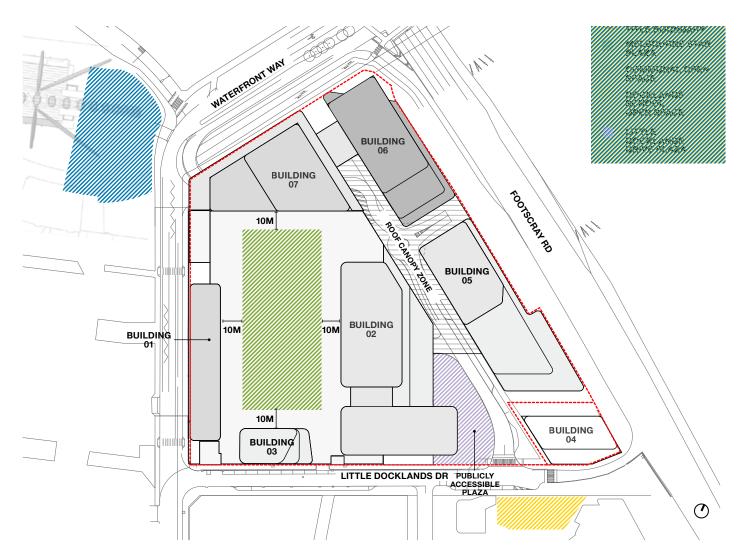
Concept Plan 10 - Shadowing, Elevated Communal Open Space
